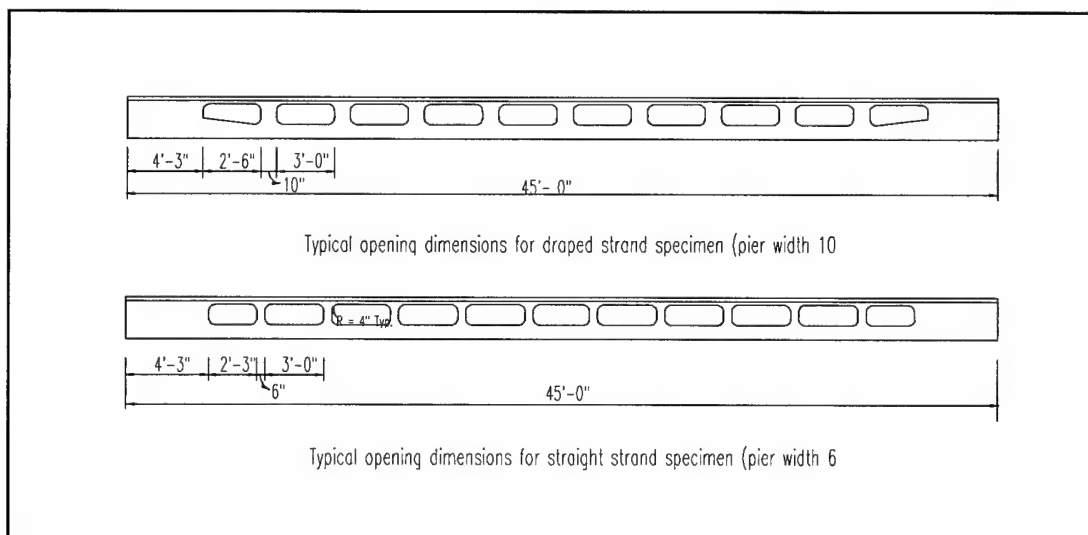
Opening locations in single-tee with straight and draped strands.
